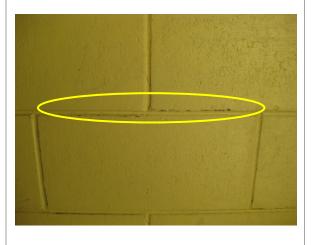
Hairline cracking along Mortar Joints on North Wall inside Ladies
